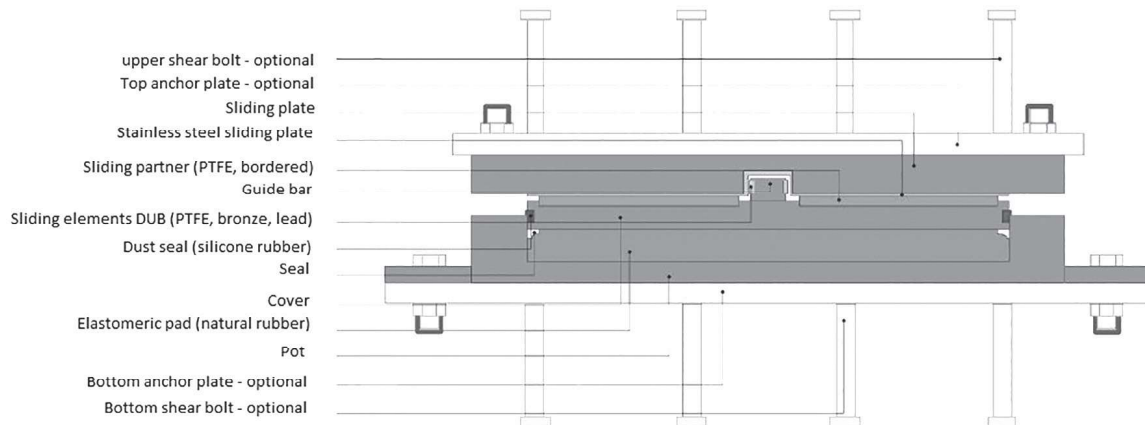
Components of Pot Bearing (source: mageba.cn)
